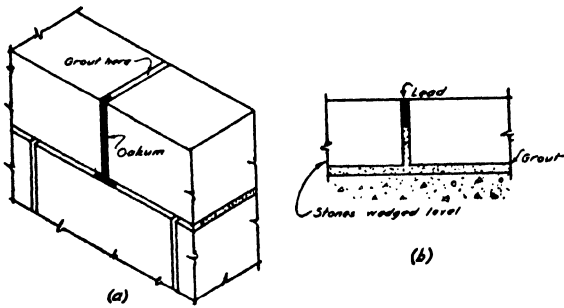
Grouting Stone Joints. (a) ashlar; (b) flagging.
